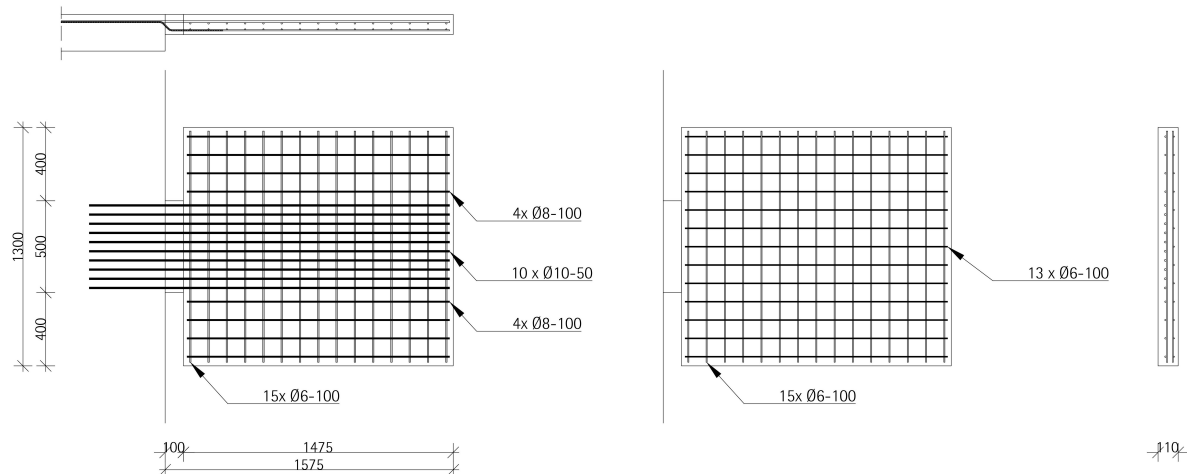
Design of balcony with ridge, including reinforcement configuration. Left: Top reinforcement. Right: Bottom reinforcement.
